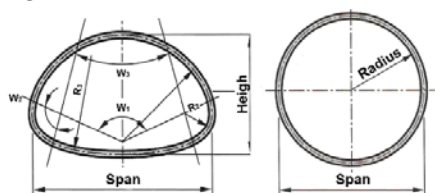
Cross-sections of Spiral Pipe Culverts: Jaw-shaped and Circular
